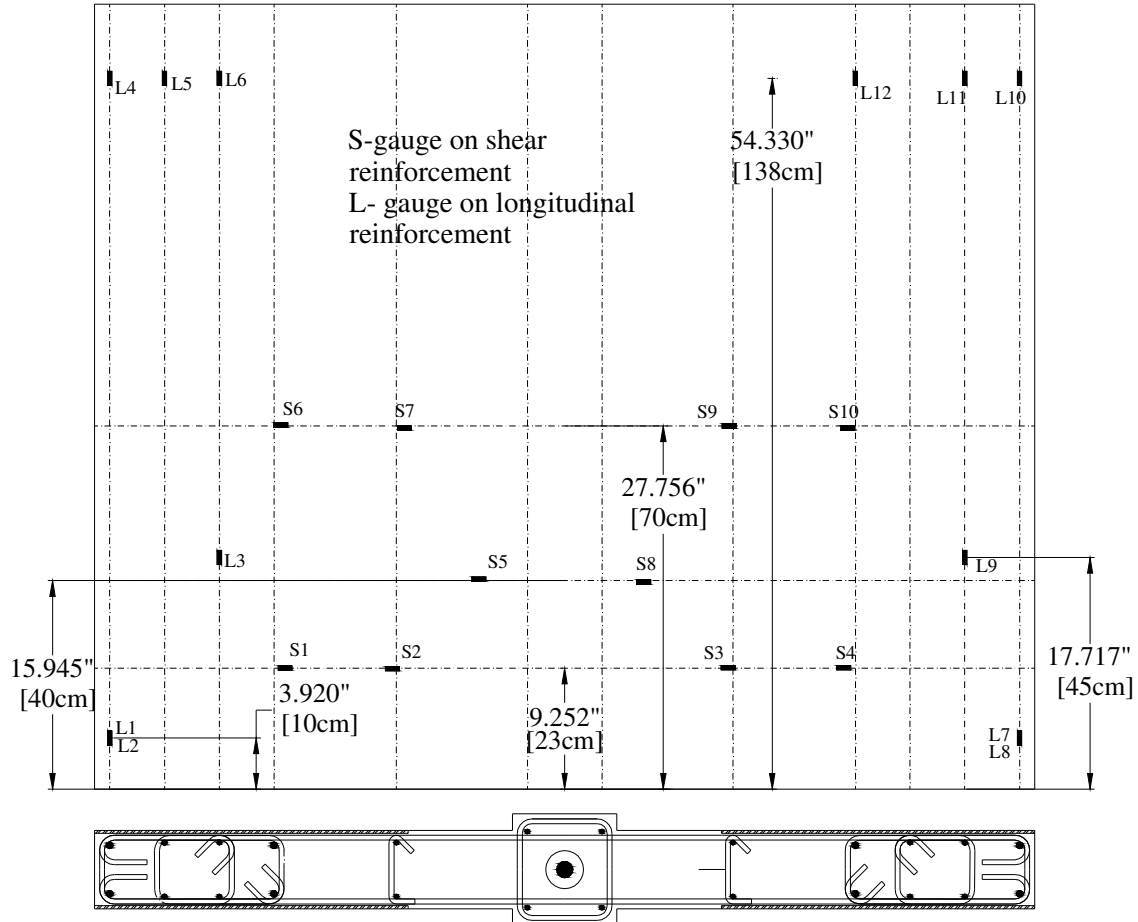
Locations of the strain gauges mounted to the longitudinal and shear reinforcement of the wall panel
